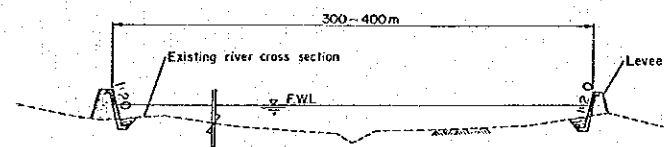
Proposed River Improvement Plan (3/8)
